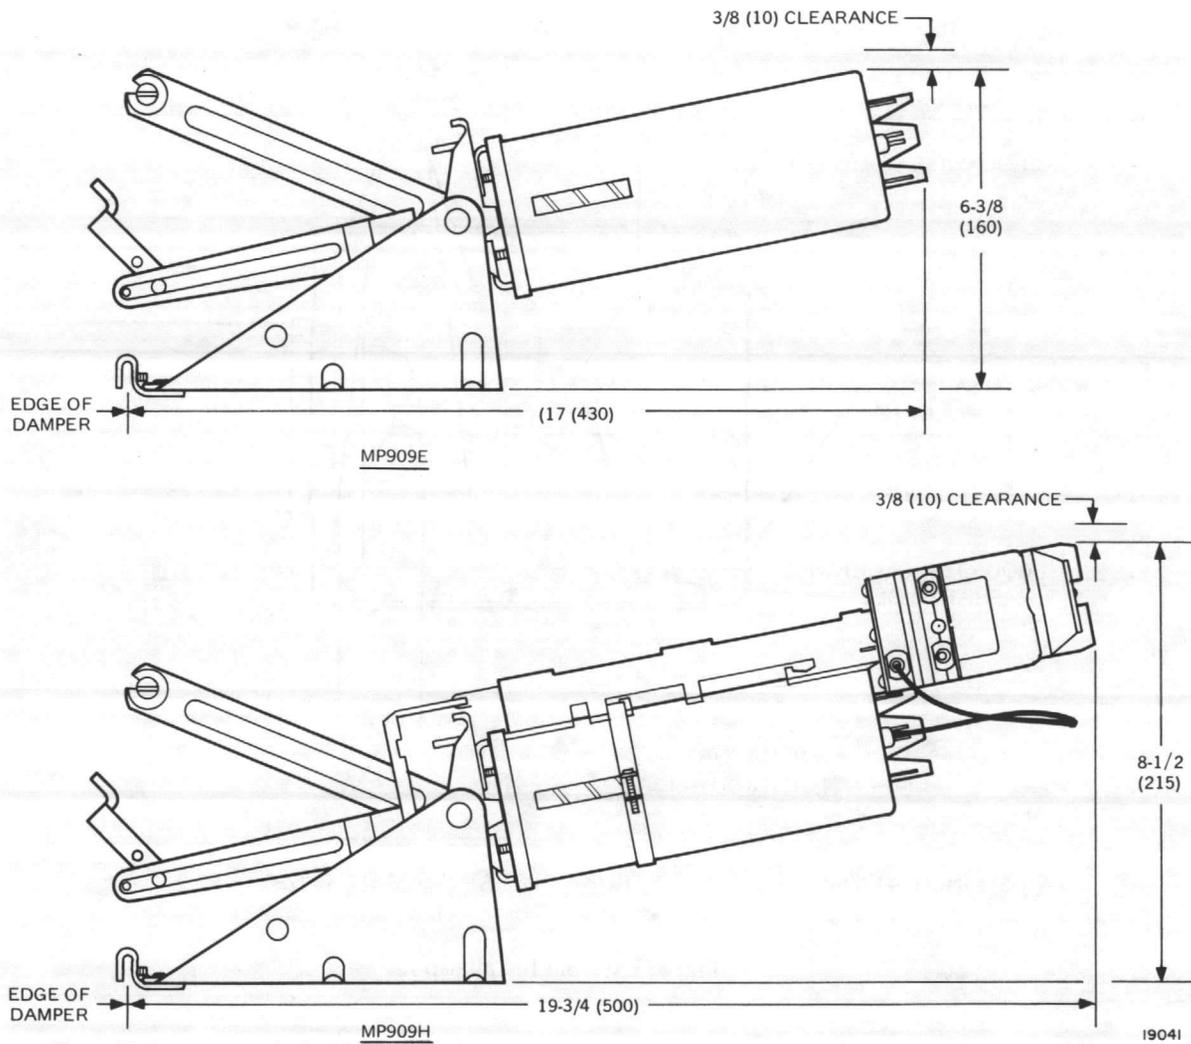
Internally mounted Normally Closed Mounting Dimensions in Inches (Millimeters).
